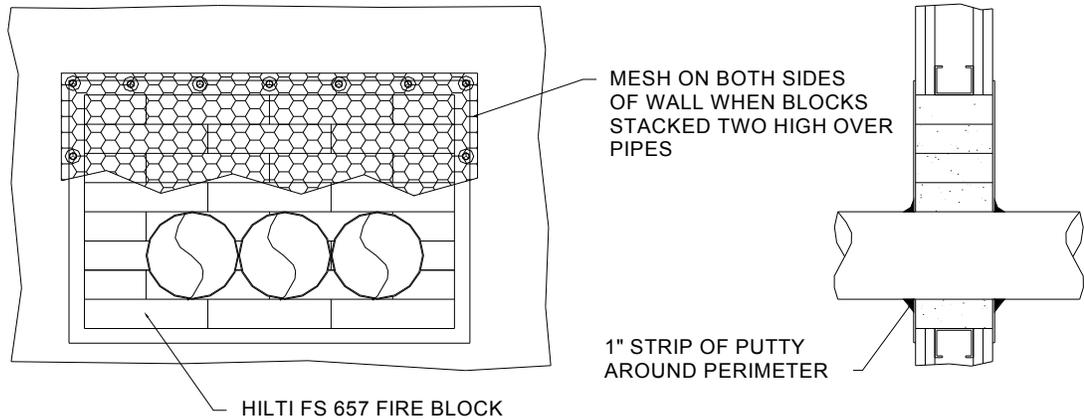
BUILDING SERVICES MULTIPLE ITEMS THROUGH WALLS
